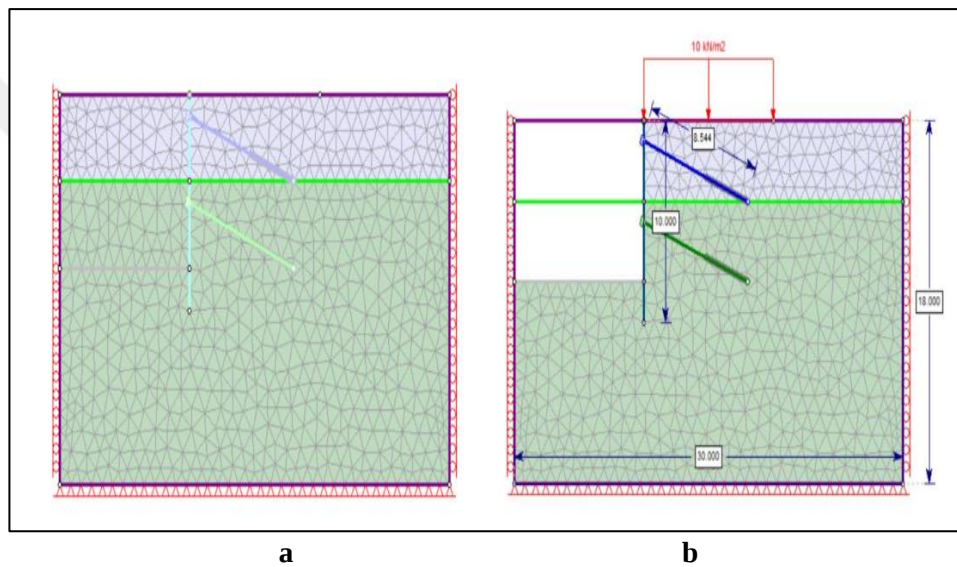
Soil Model a) Before Excavation and b) After Excavation with Anchored Sheet Pile. [79]
